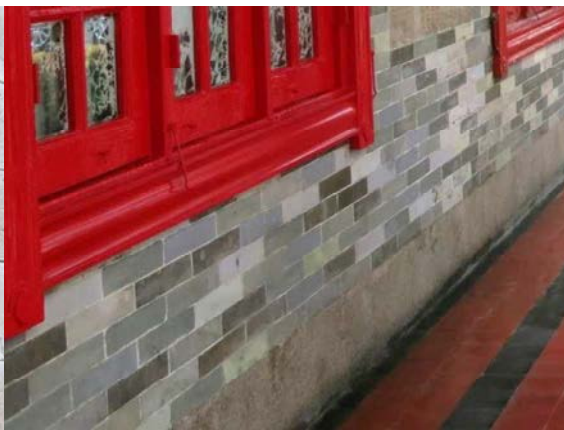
Jointless grey gauged brickwork at Tung Wah Museum.
